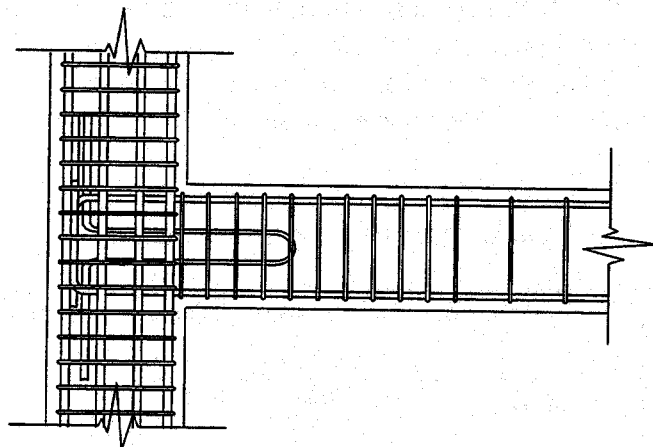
Vertically-anchored intermediate longitudinal reinforcement
